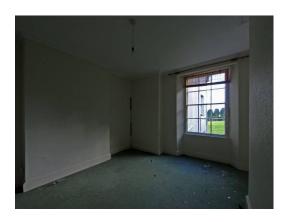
Rear Wing, first floor, Room 56 looking southeast showing blocked fireplace, c.1831 sash window, ceiling cornice, and pre-1831, thicker walling left of window
